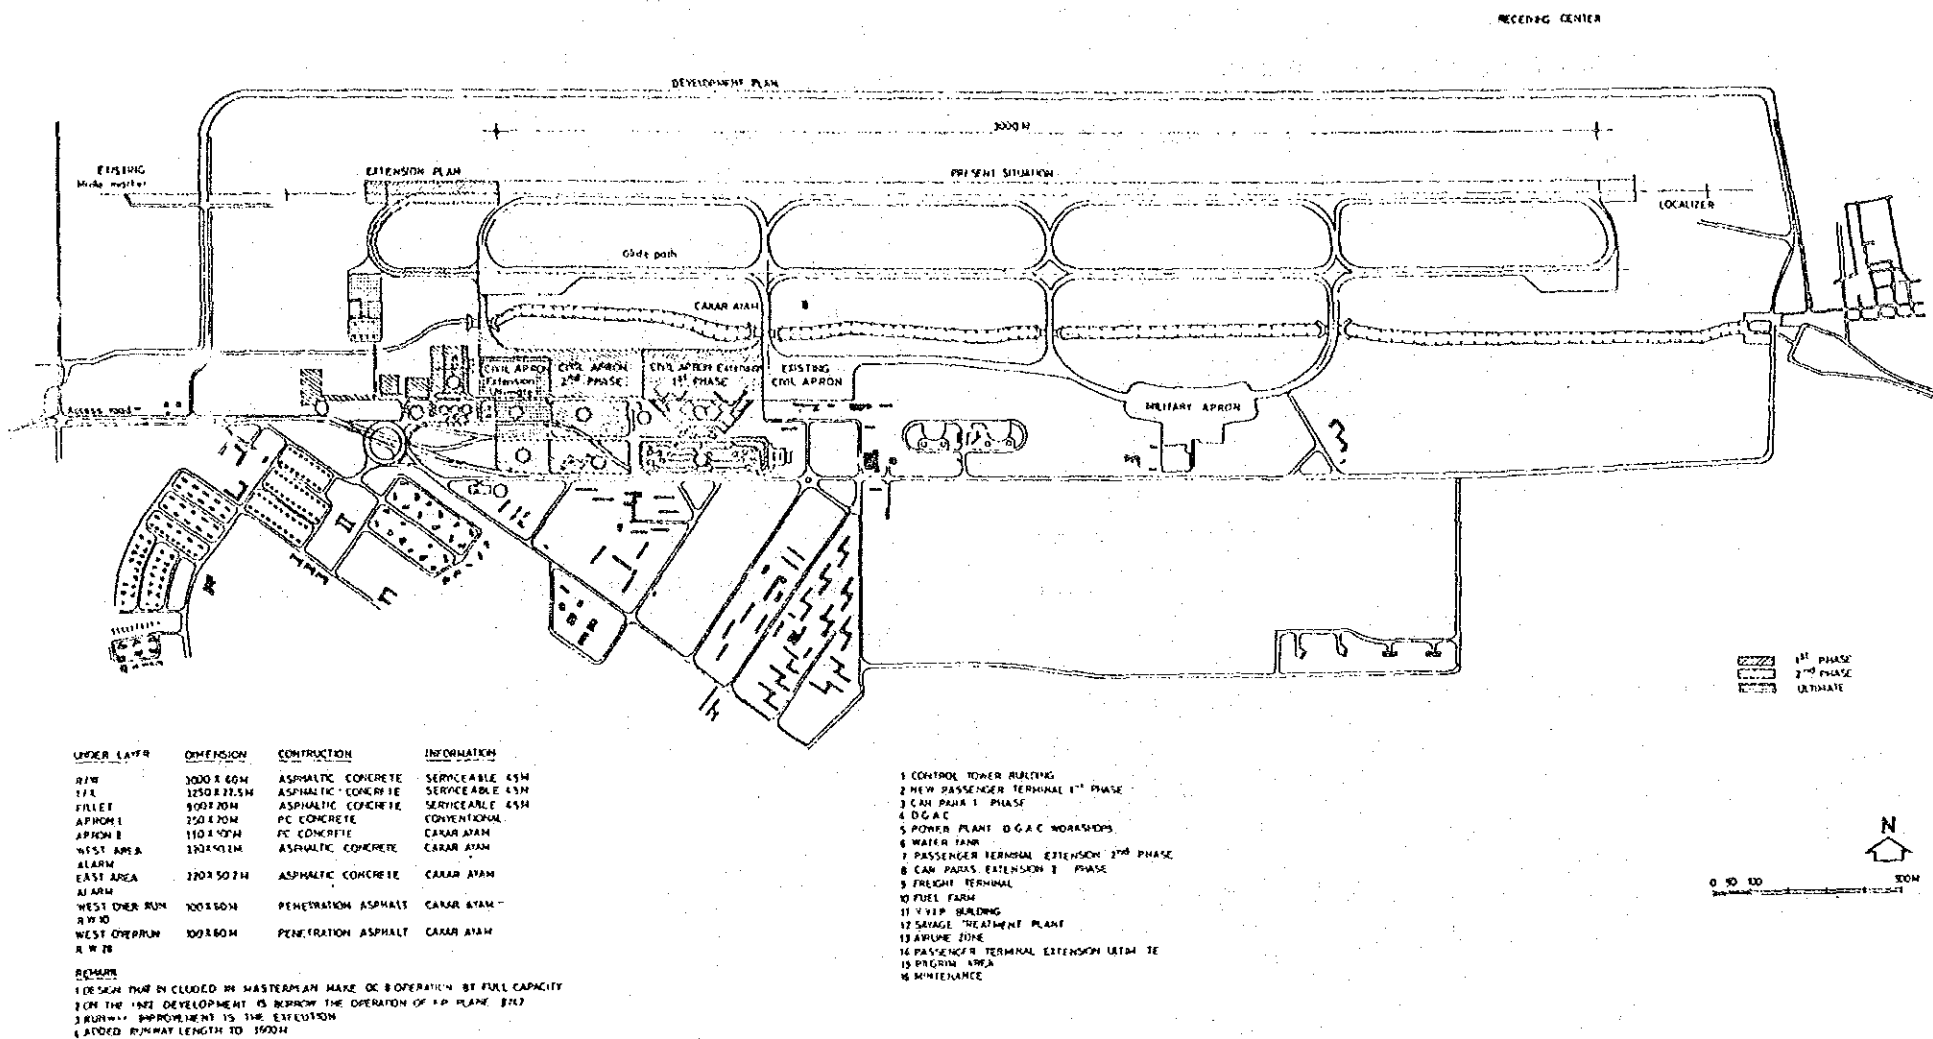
DEVELOPMENT PLAN OF JUANDA AIRPORT
